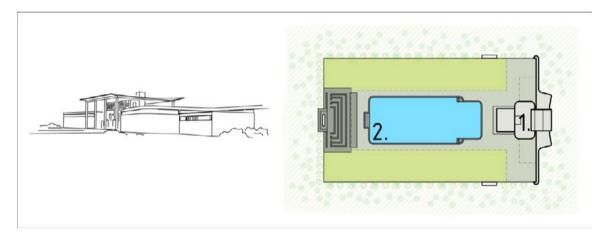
Situation plan and architecture scheme of Ciechocinek swimming pool, 1. Main building, 2. swimming pool.
